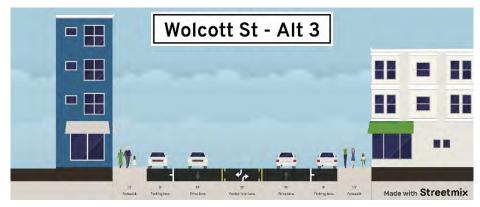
WOLCOTT ST ALTERNATIVE 3 PROPOSED CROSS SECTION
